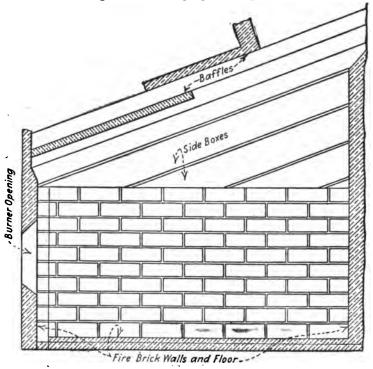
Interior View of Furnace B. & W. Oil Burner
